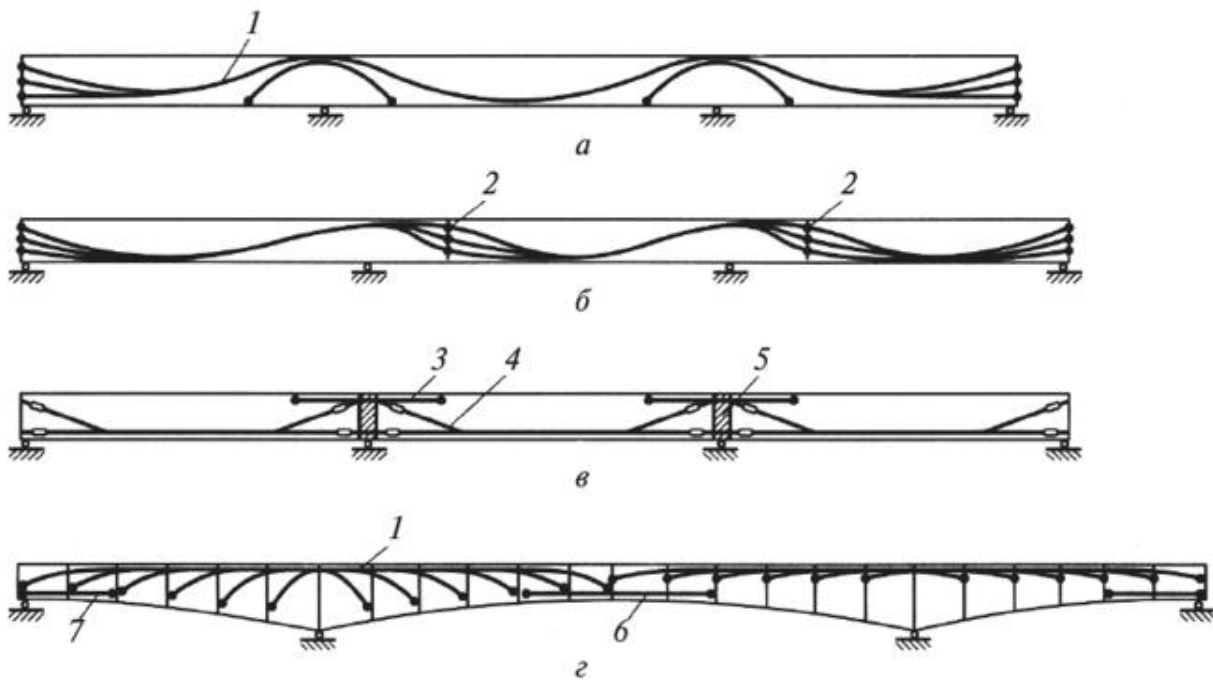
Variants of reinforcement schemes with prestressed reinforcement (a - g): 1 - prestressed reinforcement bundles; 2 - concreting seam; 3 - prestressed reinforcement bundles for connecting prefabricated beams to a continuous intermediate structure; 4 - prestressed reinforcement before concreting; 5 - monolithic seam connection of prefabricated beams; 6,7 - lower prestressed reinforcement for receiving positive bending moments
